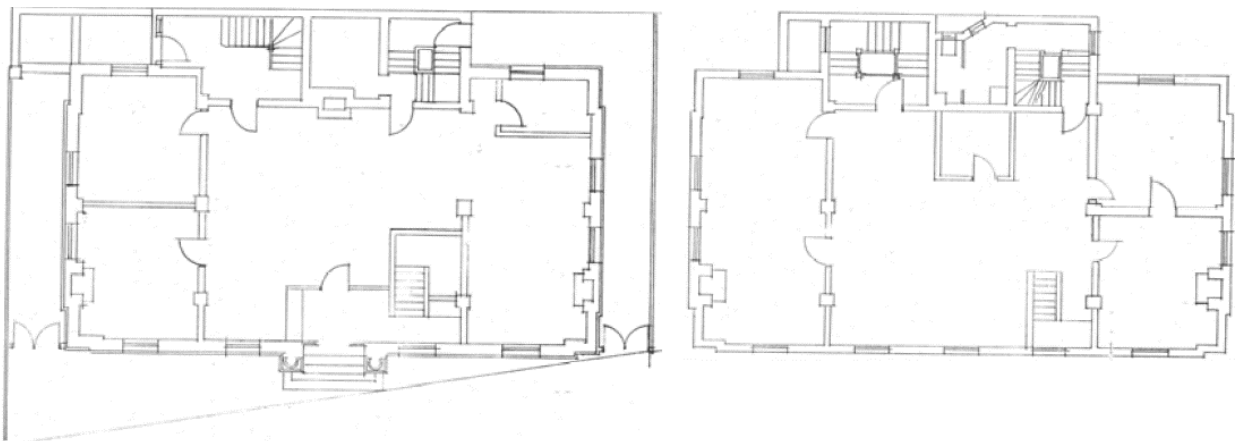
Ground floor plan (left) and first floor plan (right) of the Bureau of Meteorology, circa 1962. (Source: TKD 2016: Fig 41).
